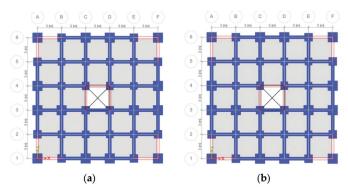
(a) G + 50 shear wall with opening Floor Plan; (b) G + 50 shear wall without opening Floor Plan.
